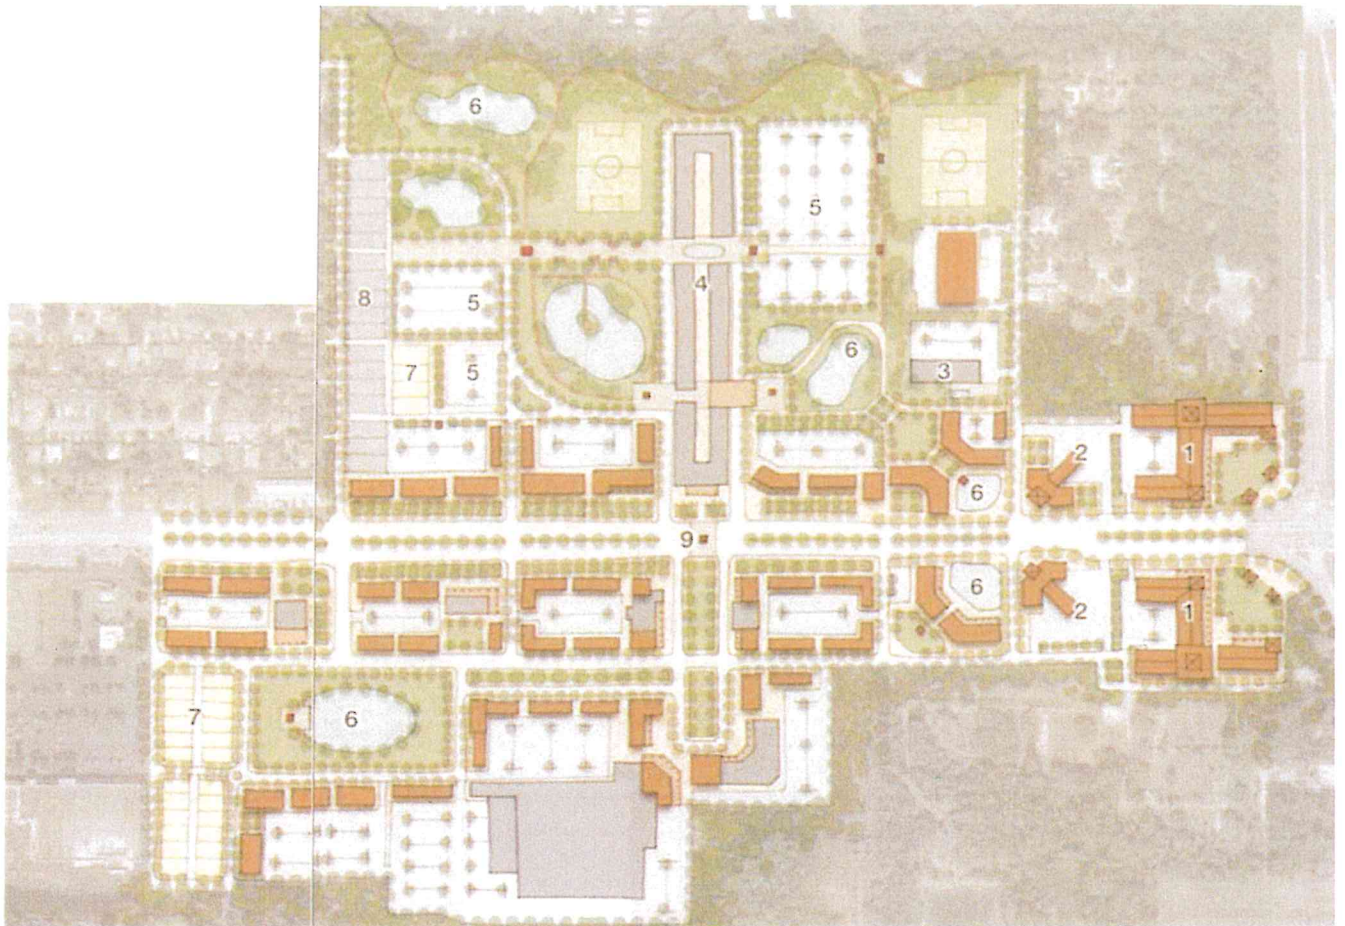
V-14 illustrative design for redevelopment (Northeast area of Imperial Parkway and Bonita Beach Road)
